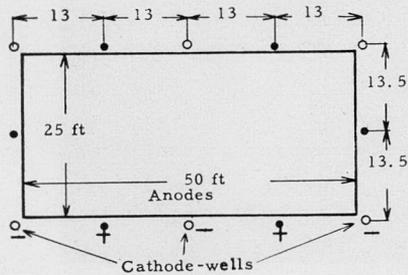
ARRANGEMENT OF ELECTRODES FOR BRIDGE FOUNDATION AT SALZGITTER.
